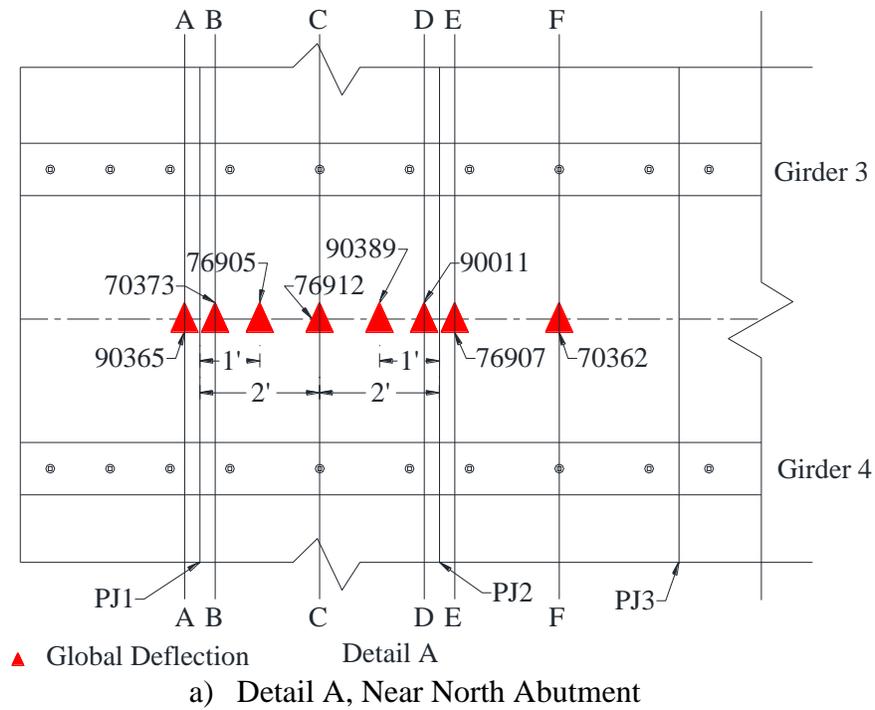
Instrumentation layout near supports, demonstration bridge 2010
